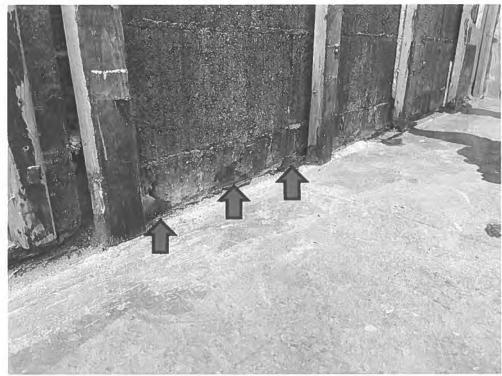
Water Infiltration Noted at the Base of the Back-Up Wall
